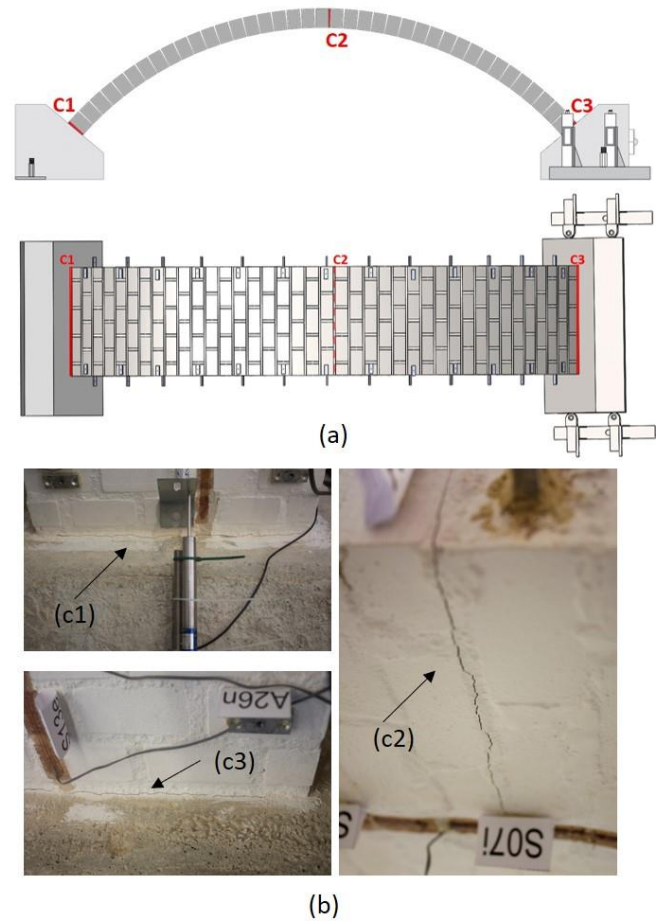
Arch damage: a) view of crack location; b) crack C1, C2 and C3.
